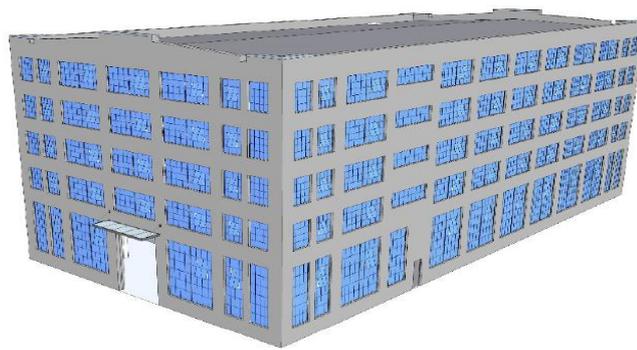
Illustration of a building with a soft ground story due to tall piers.
